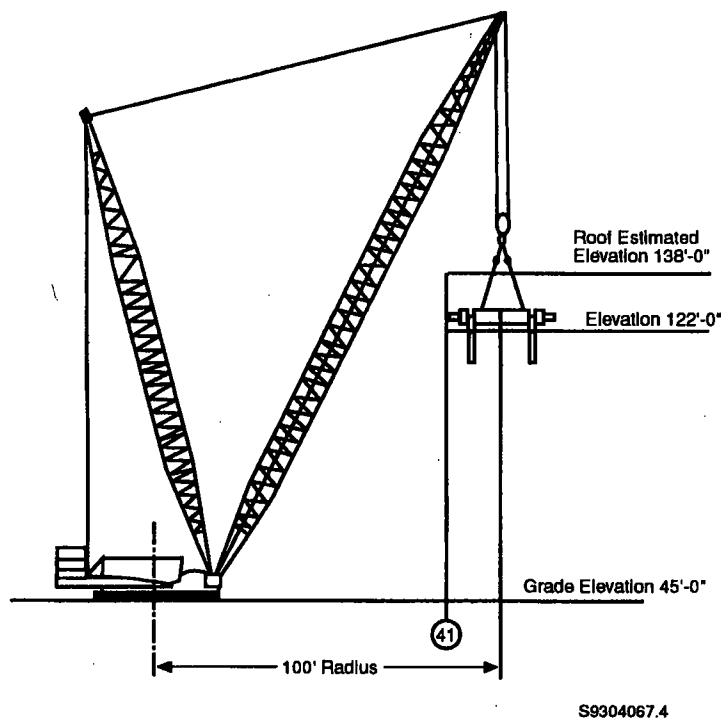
Conceptual decommissioning plan for the Fuel Building crane
